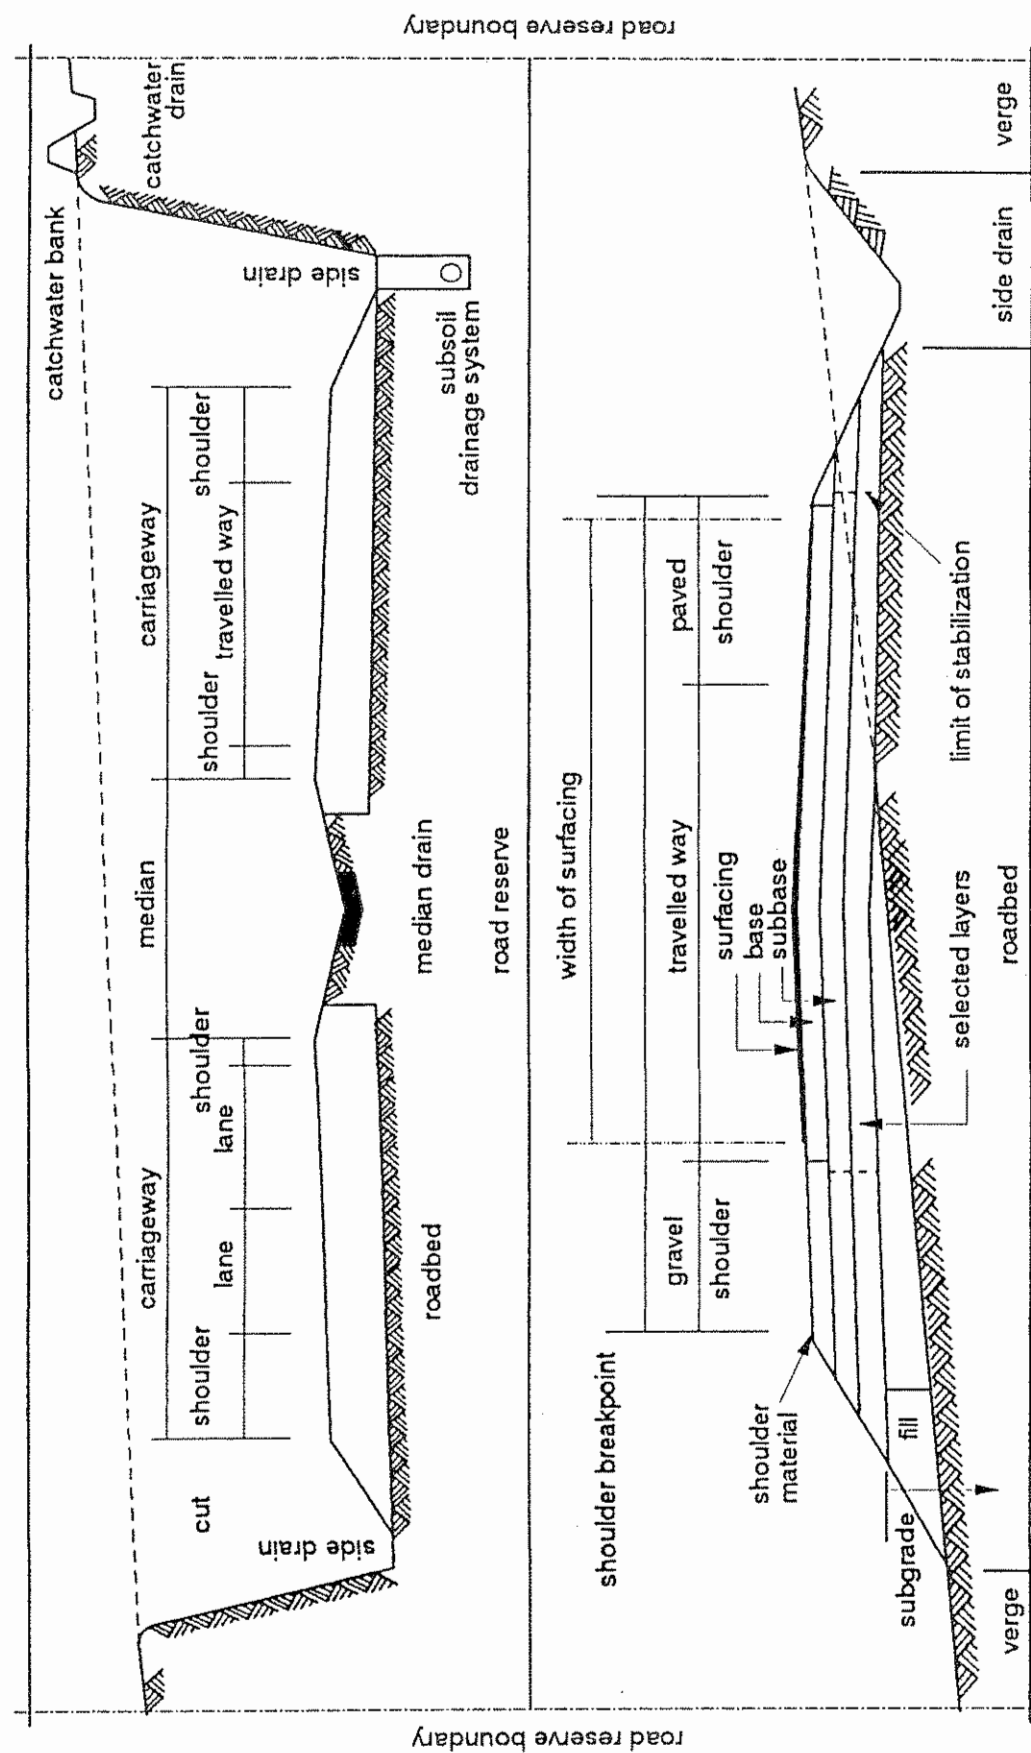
PAVEMENT STRUCTURE TERMINOLOGY
